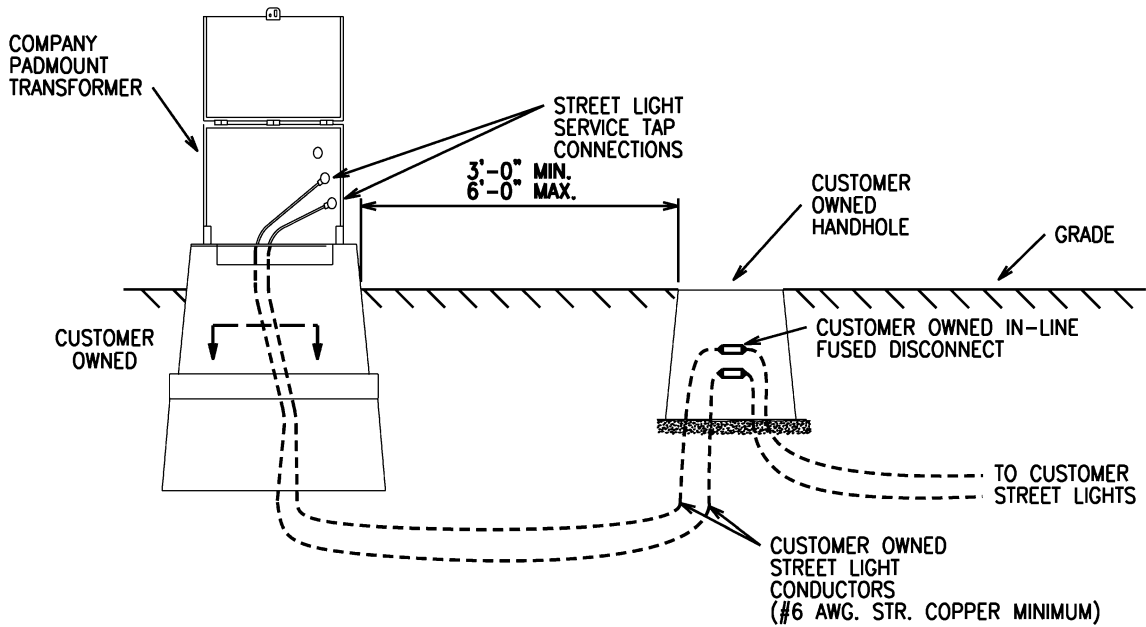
Connection of Underground Supplied Street Light to PPL Padmount Transformer
